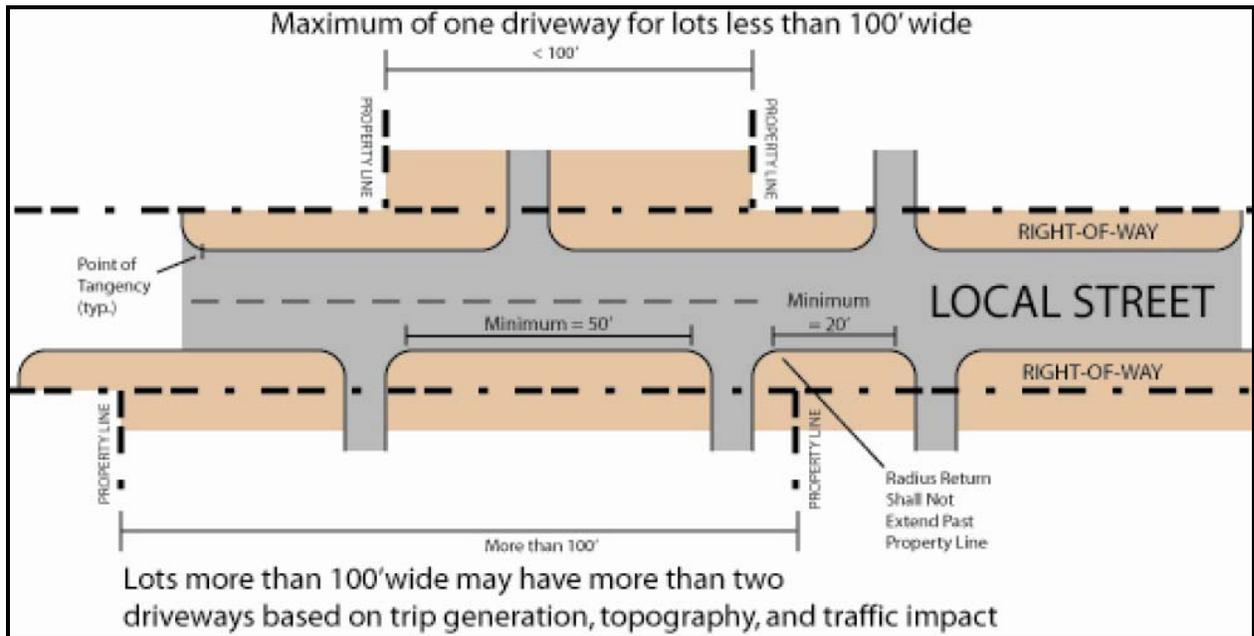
(10) – Local Street Driveway Spacing Criteria
